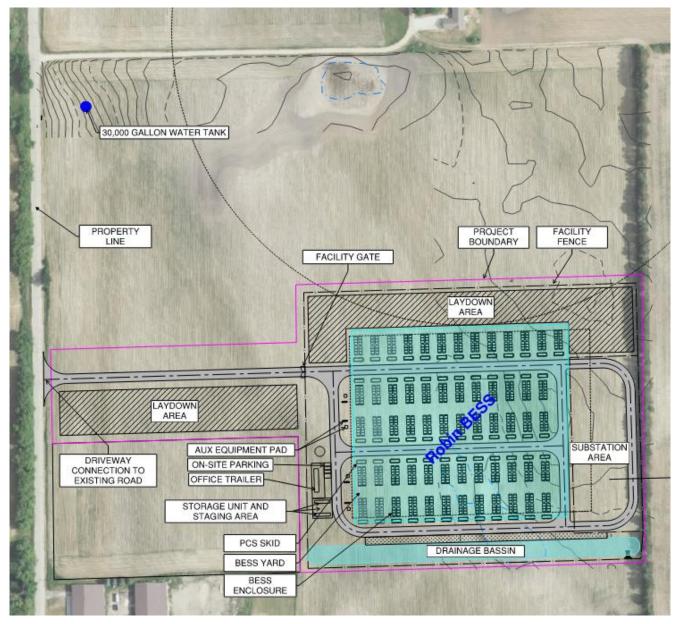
Overall Plan for the Robin Project Site. Adapted from [3].
